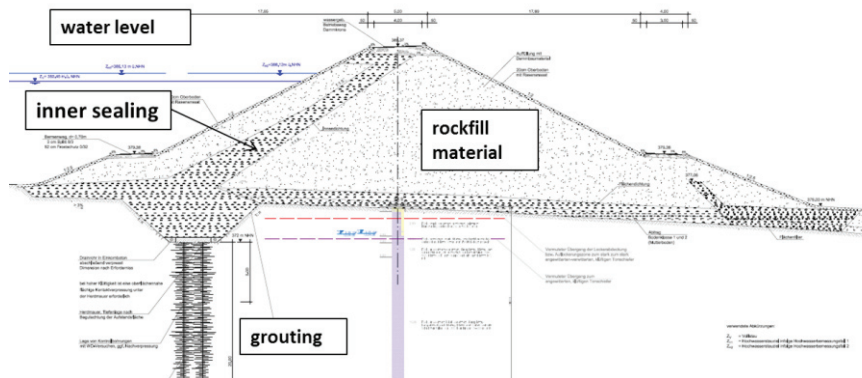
Cross section through the dam of the flood protection reservoir Straßberg (Source: BCE/TSB)
